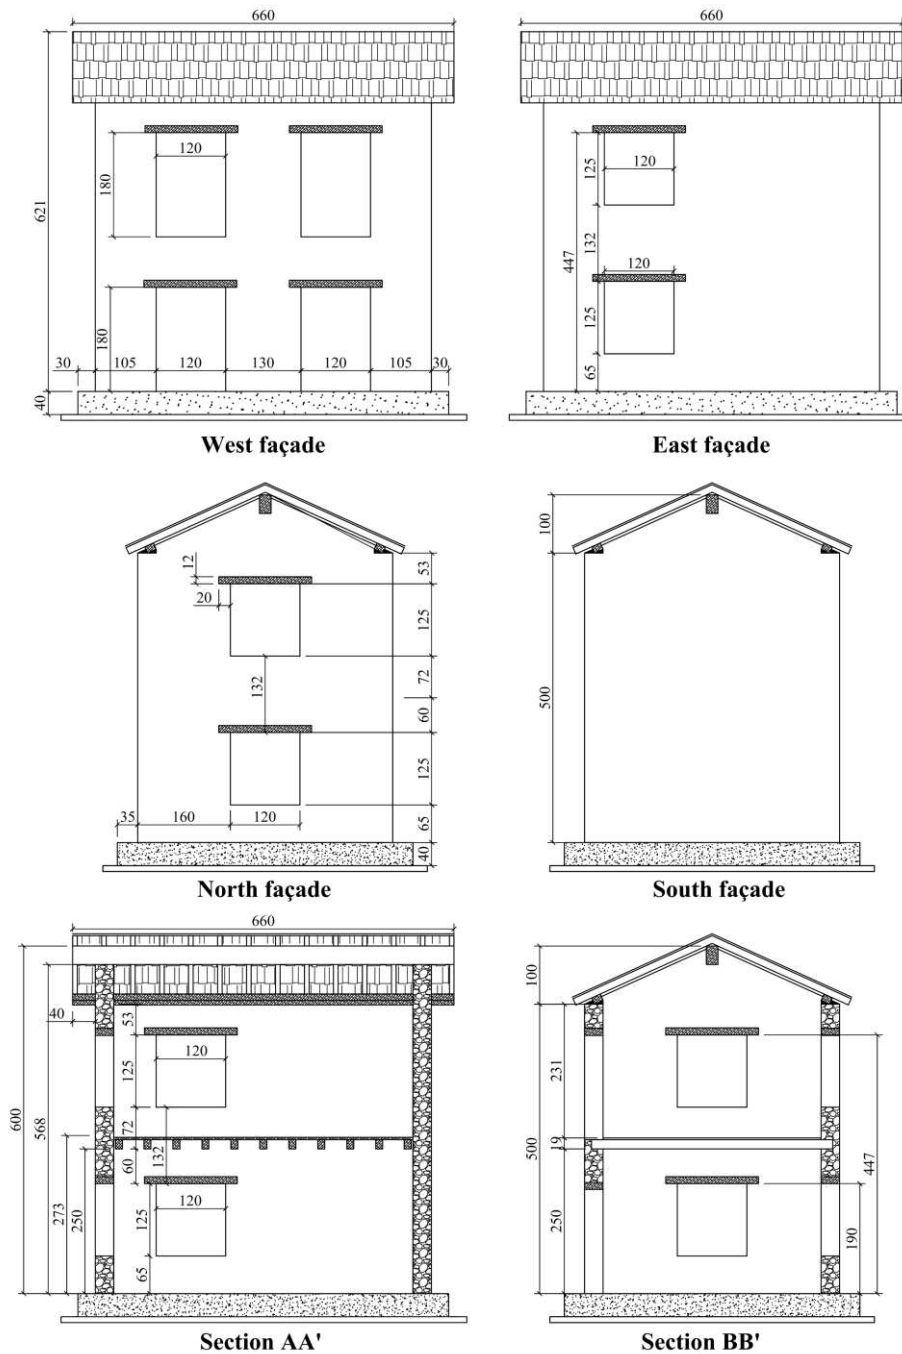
Elevation views and vertical sections of the reference building prototype (Building 1). Units of *cm*.
